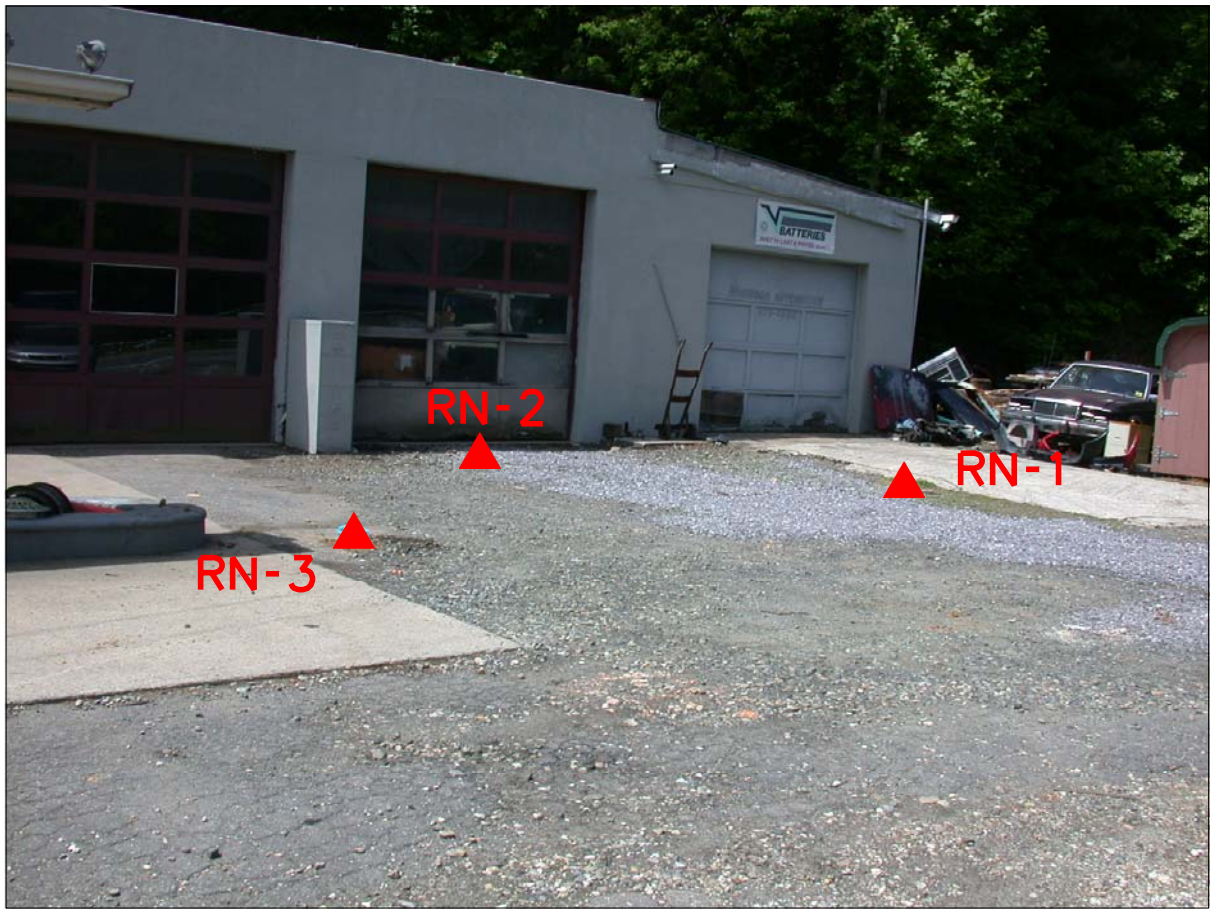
BORINGS AT ROBINSON PROPERTY (SOUTHWEST VIEW)
